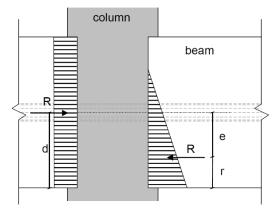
Beam-column interface for different stages and for the asymmetrical load case (i.e. frame under horizontal loading)
